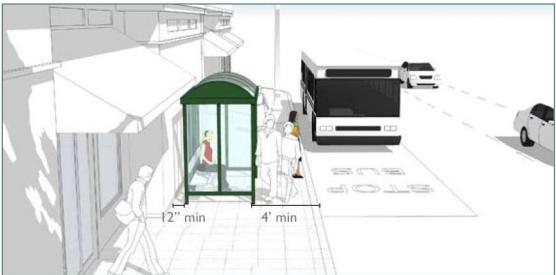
10' sidewalk: Bus shelter adjacent to building
